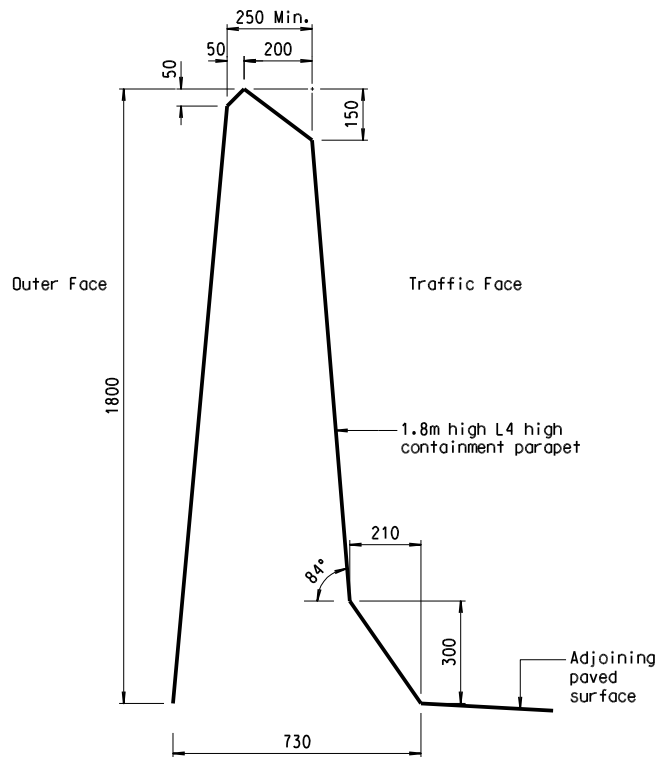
Dimension of L4 Reinforced Concrete High Containment Parapets
